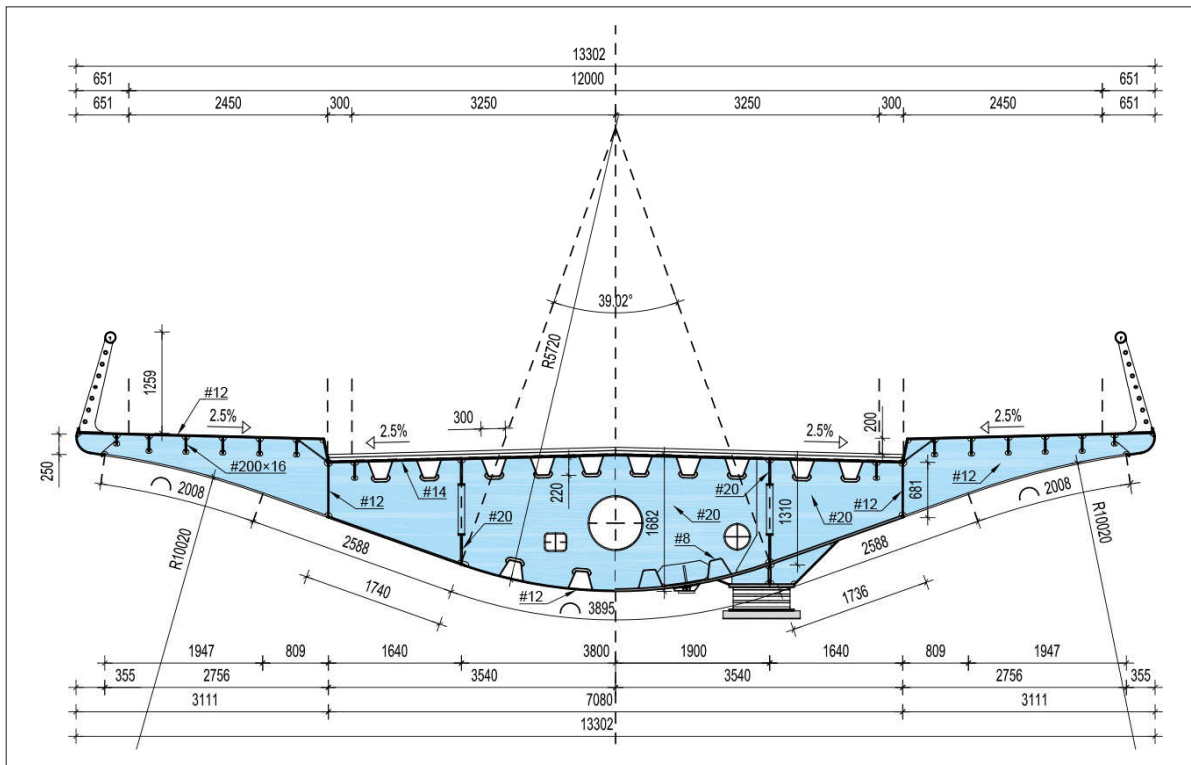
Mainland – Čiovo island bridge in Trogir cross section [1]
